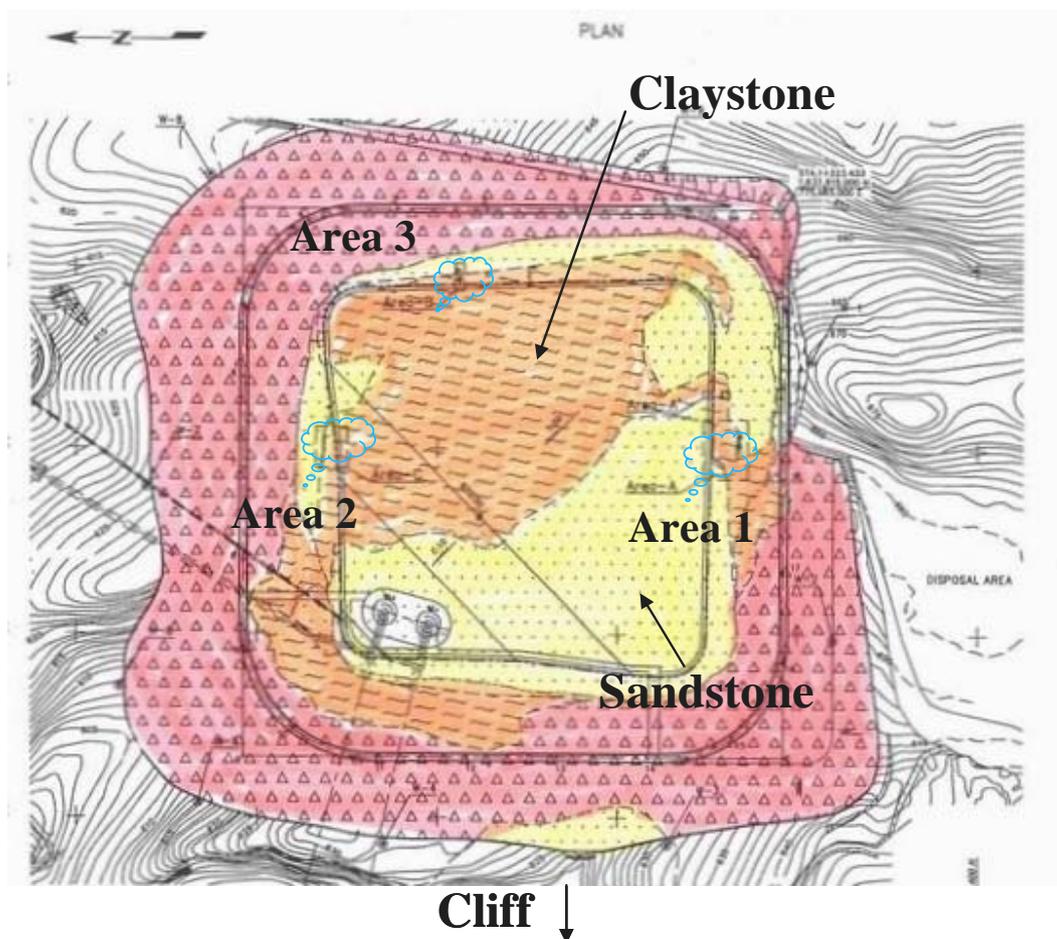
Layout plan, geology and areas of asphalt face rupture of Upper Pond
